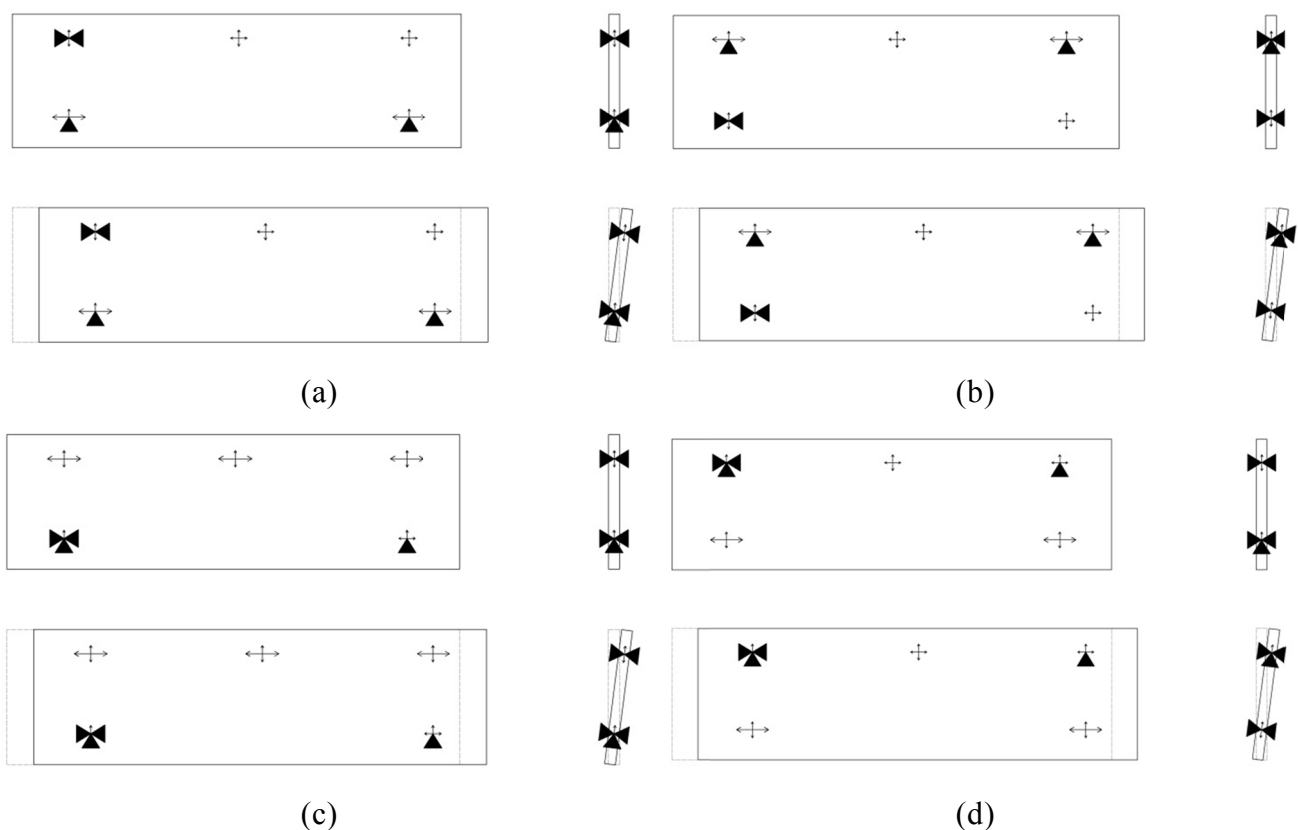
Isostatic swaying arrangements for horizontal panels: (a) sliding bottom supports, (b) sliding top supports, (c) sliding top connections and (d) sliding bottom connections
